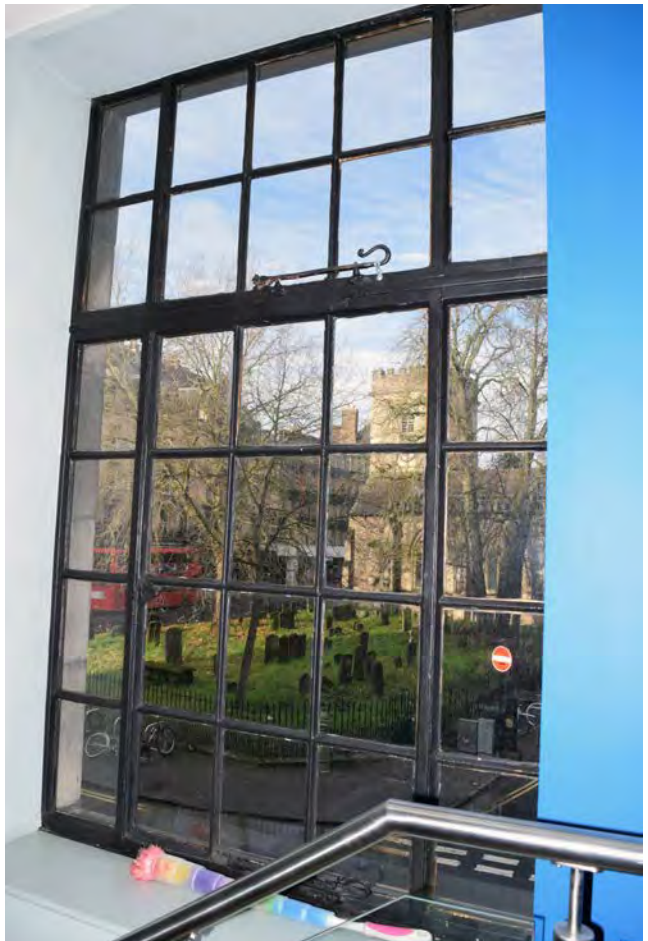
Window overlooking Broad Street in the first floor of 1 to 5 Broad Street, looking north-west
